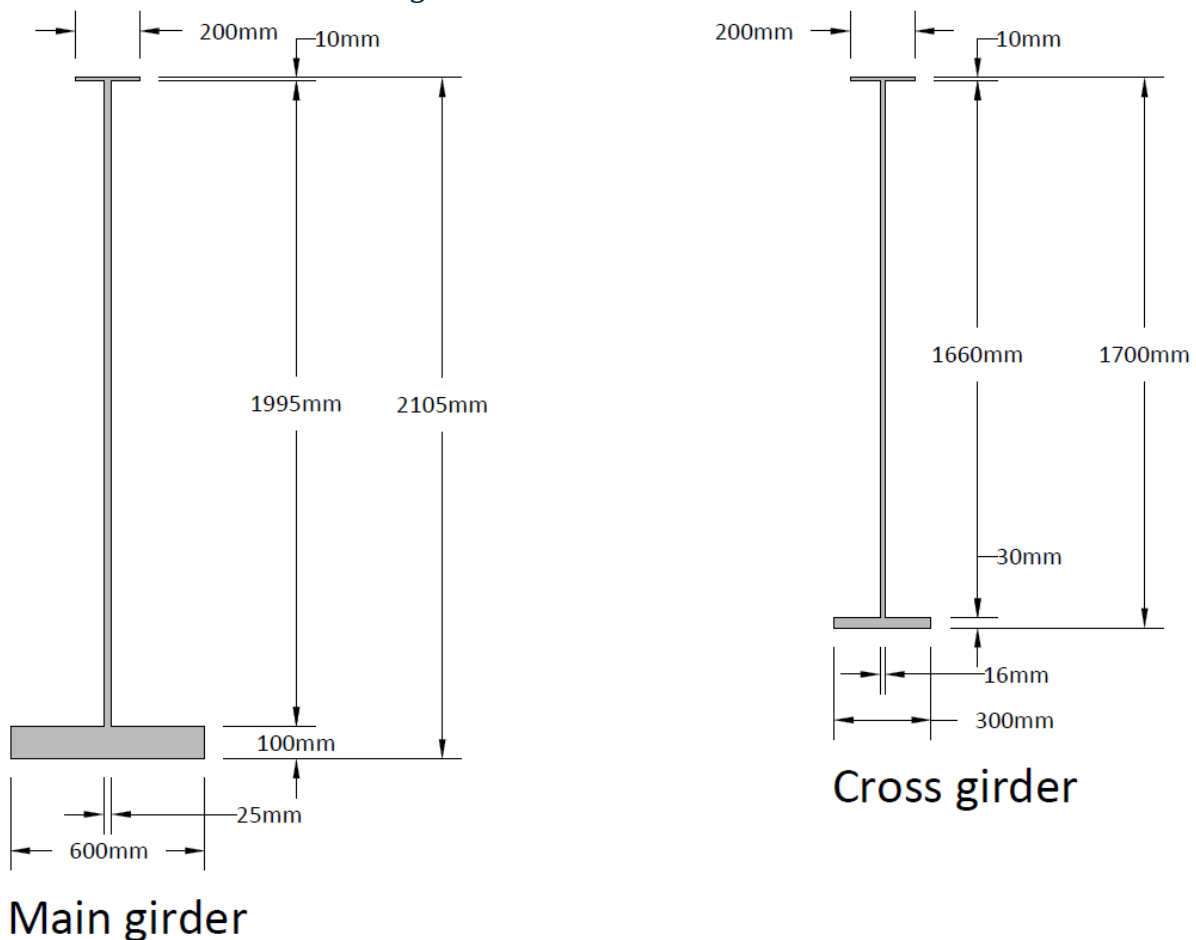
Cross sections of the main and cross girders of the hybrid design
